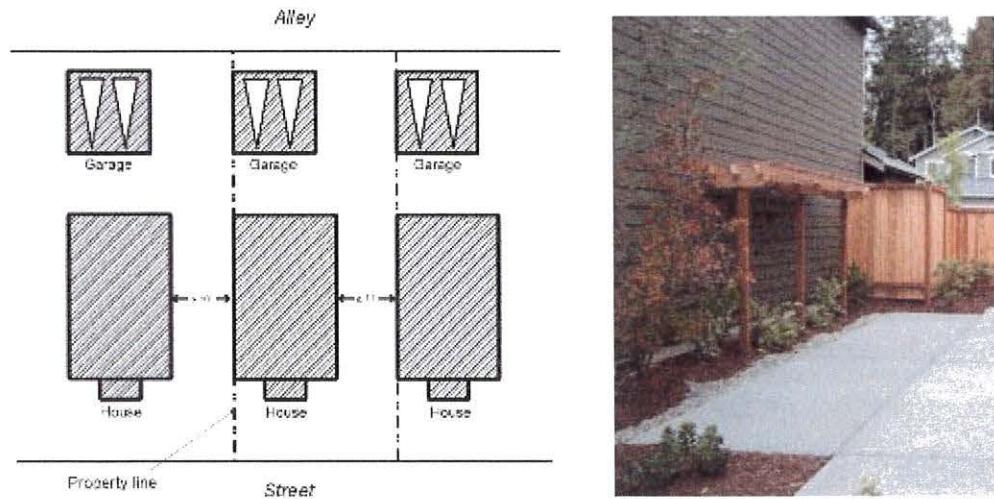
(A). Zero lot line layout example (left). The right image shows the side yard and privacy wall for a zero lot line house.
